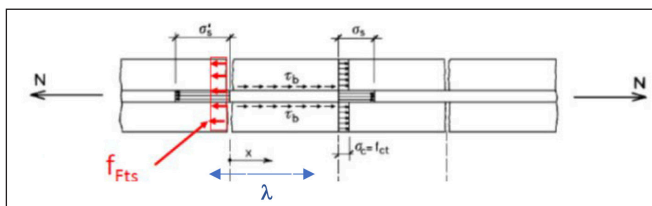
Equilibrium of a tie portion to compute the distance between a crack and a cross section where the concrete stresses are at the onset of cracking.
